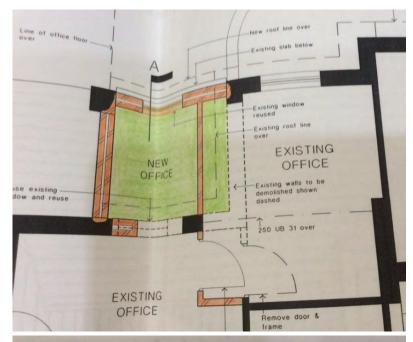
Drawings of office extension, 2001, with new section shaded in green.
